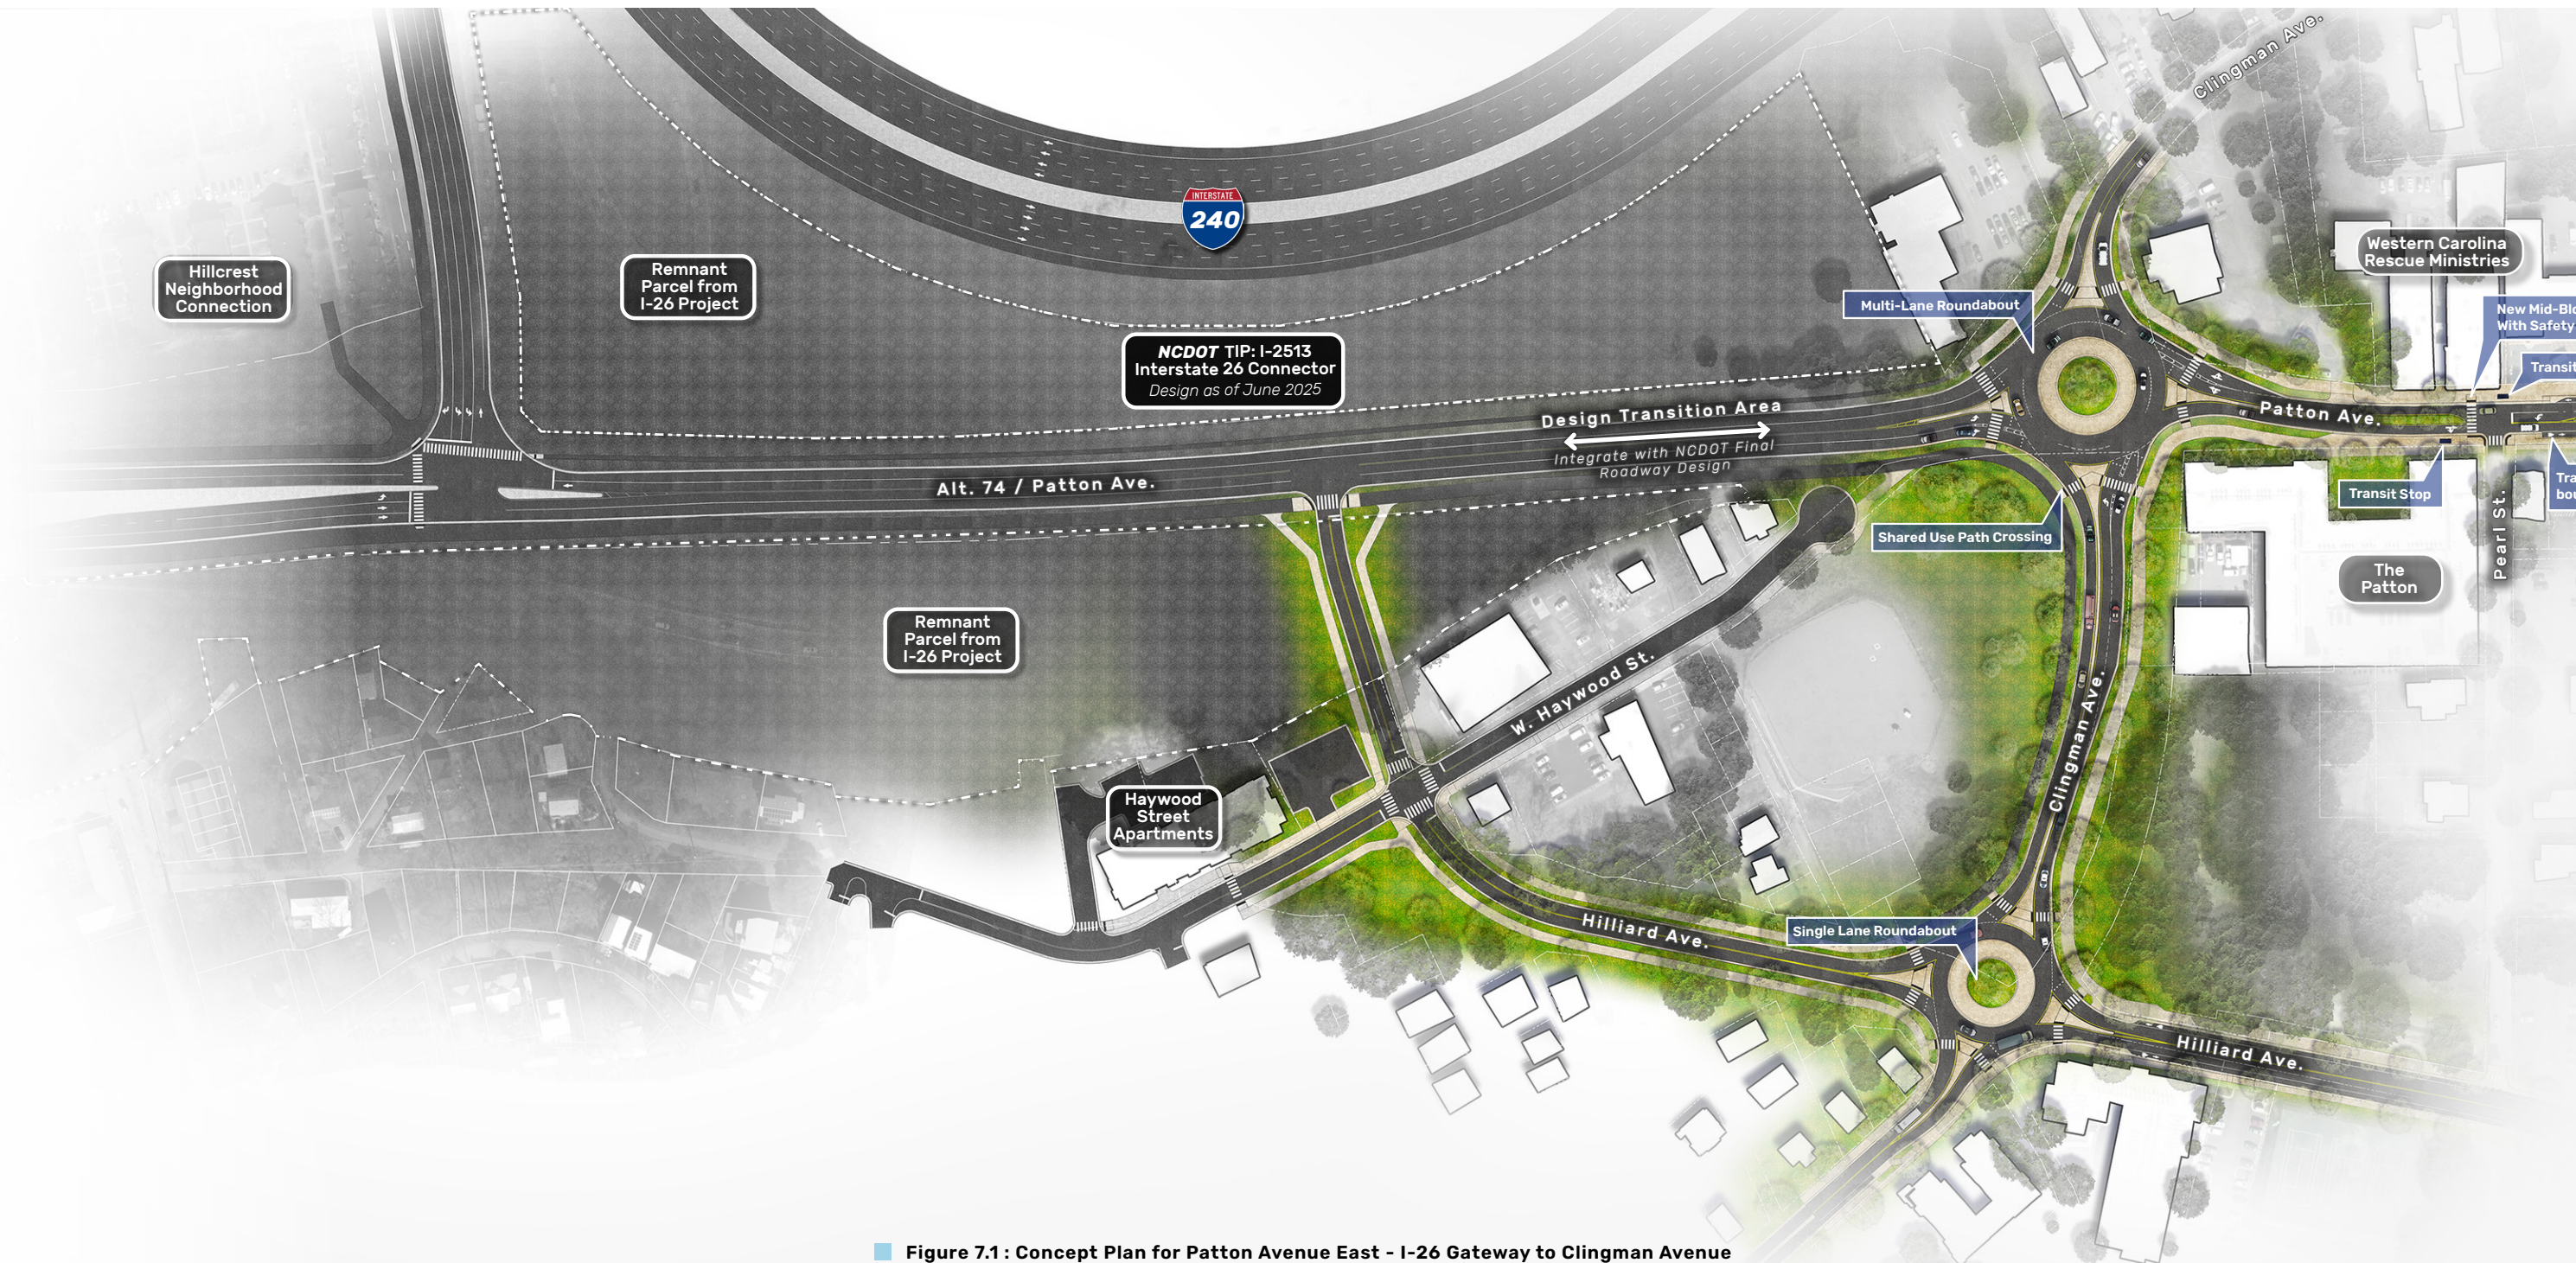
Concept Plan for Patton Avenue East - I-26 Gateway to Clingman Avenue
